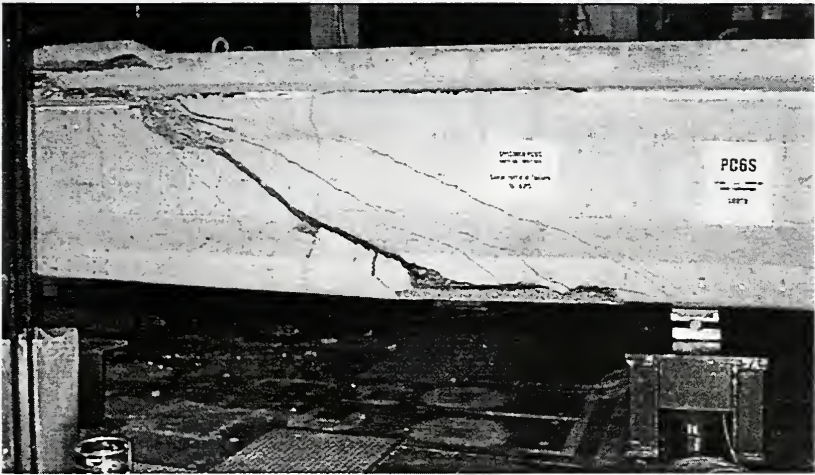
Failure Crack in South Shear Span, Specimen PC6S
